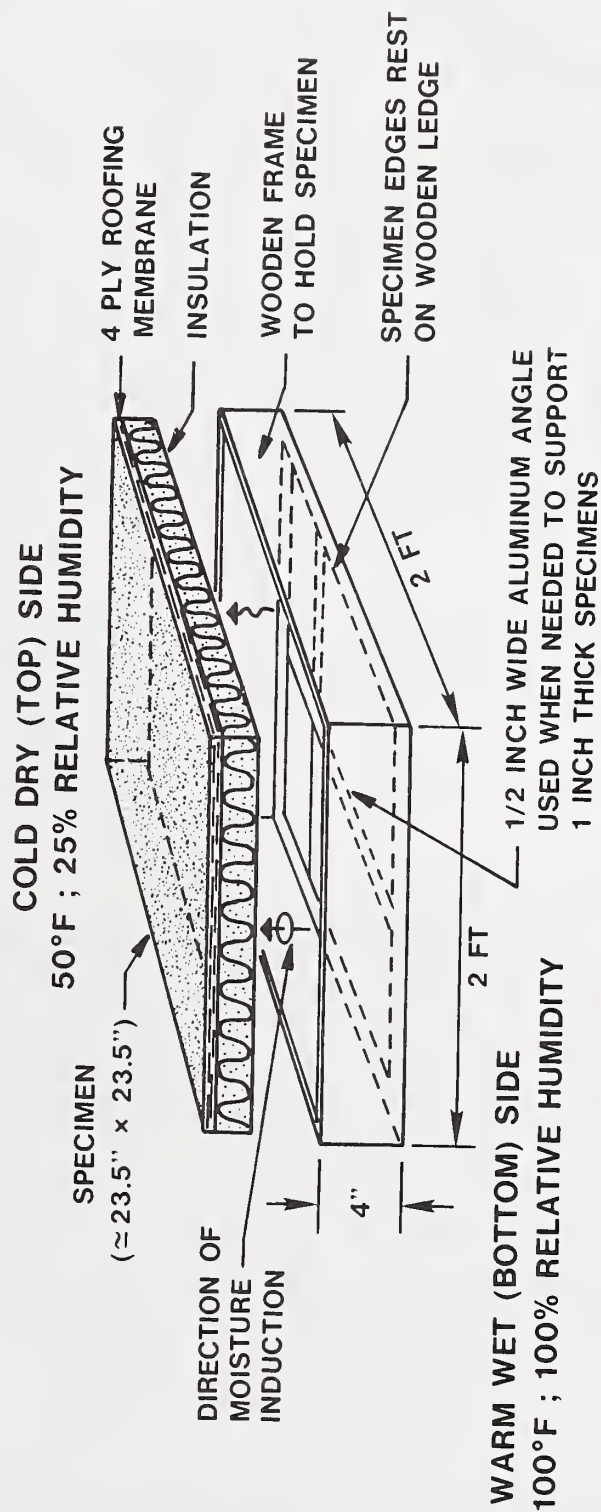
Roofing specimen, wooden supporting frame and the environmental conditions used to induce moisture.
